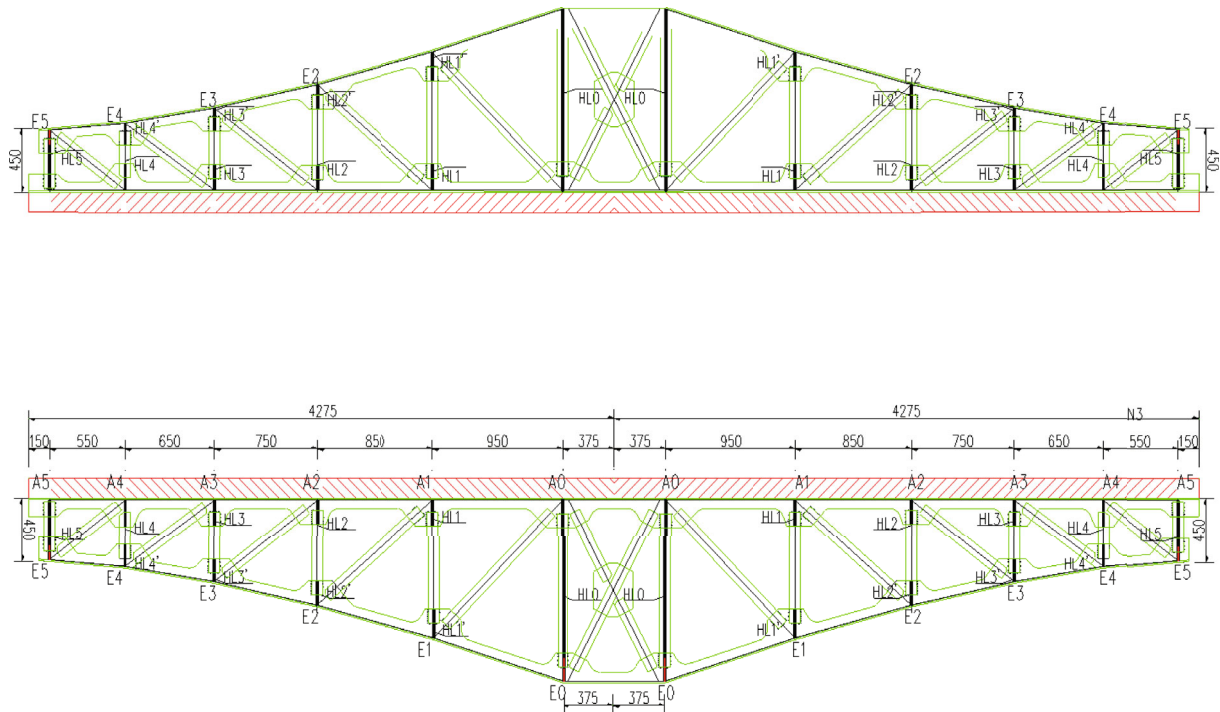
Elevation layout and size design of variable cross-section test beam in negative moment area.
